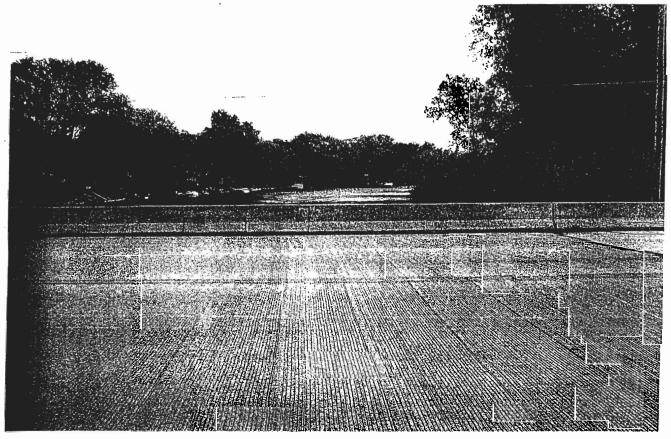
View from dam looking upstream Photo 2 - View from Highway 51 bridge looking downstream
